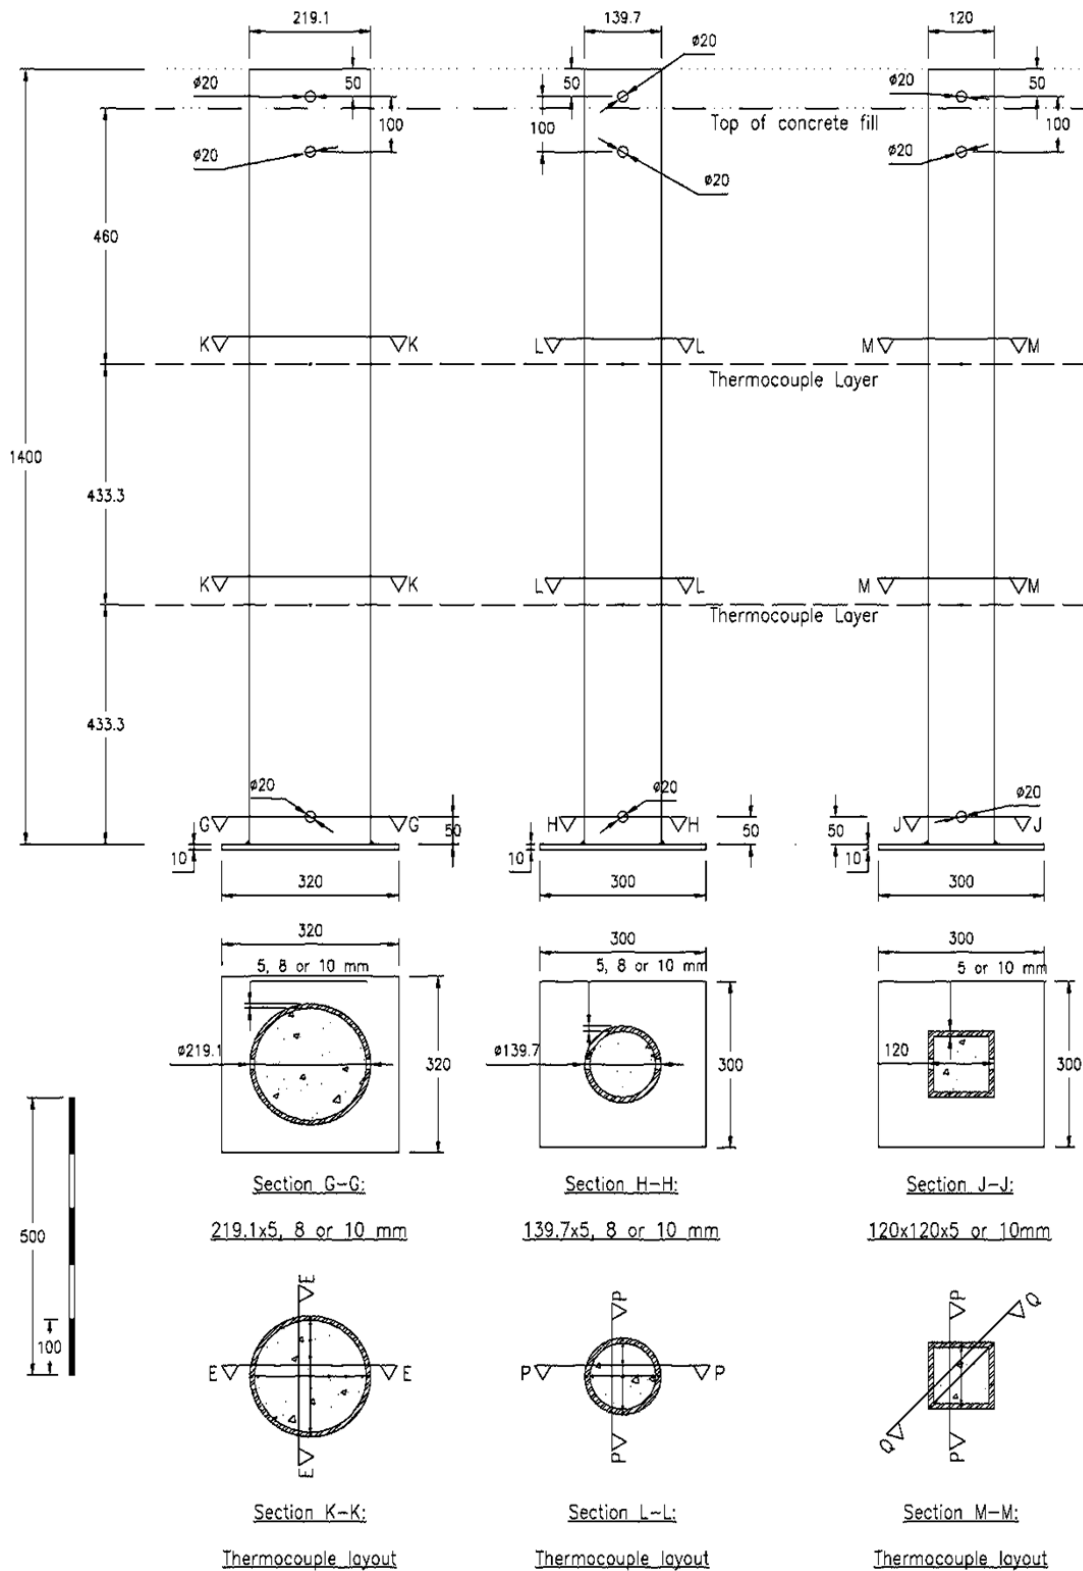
Plan, elevation and sections of C2xxxx, C3xxxx and S3xxxx sections
